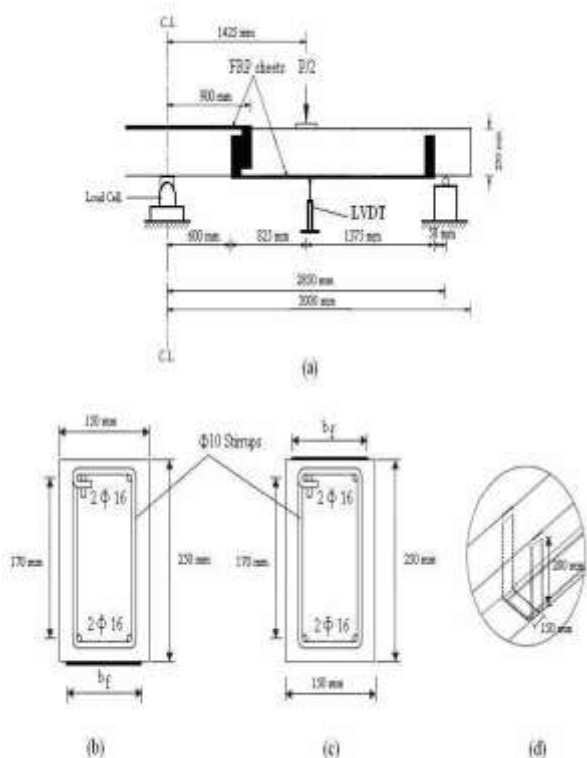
Test set-up and strengthened RC continuous beam details (a) longitudinal profile of beam (b) typical cross section of beam in sagging region (c) typical cross section of beam in hogging region (d) end anchorage system.
